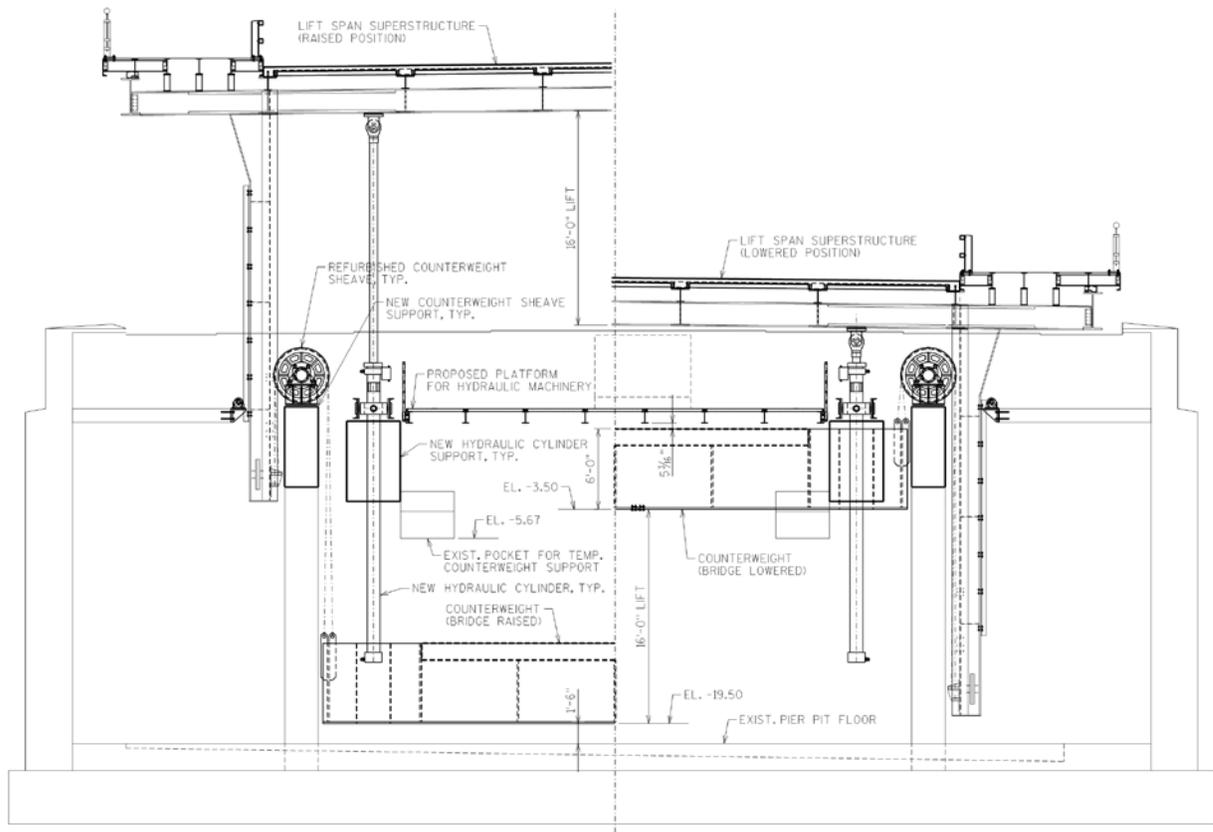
3: Elevation view of rehabbed Wisconsin Avenue Bridge lifting components. Note two hydraulic pistons used to lift superstructure and absence of equalizing cables.
